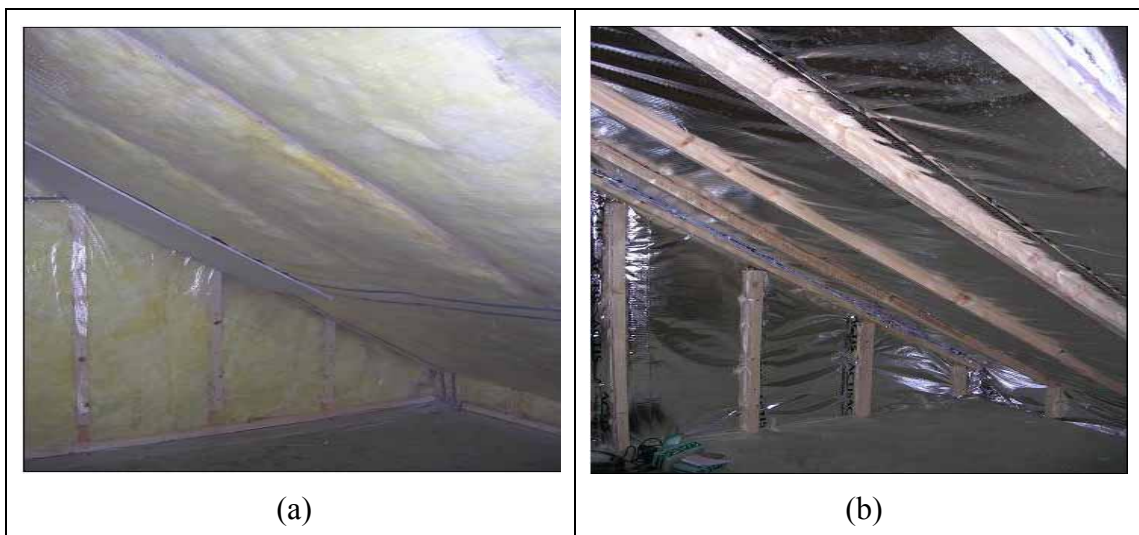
a; b - Pictures of Installed Insulation [40]
